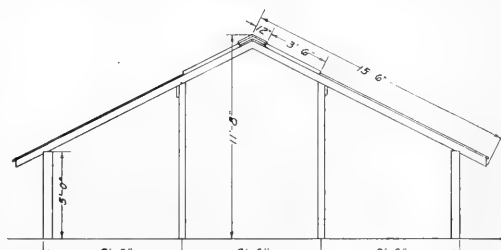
Position of skylight window row in Iowa Sunlit Hog House. House with drive.
